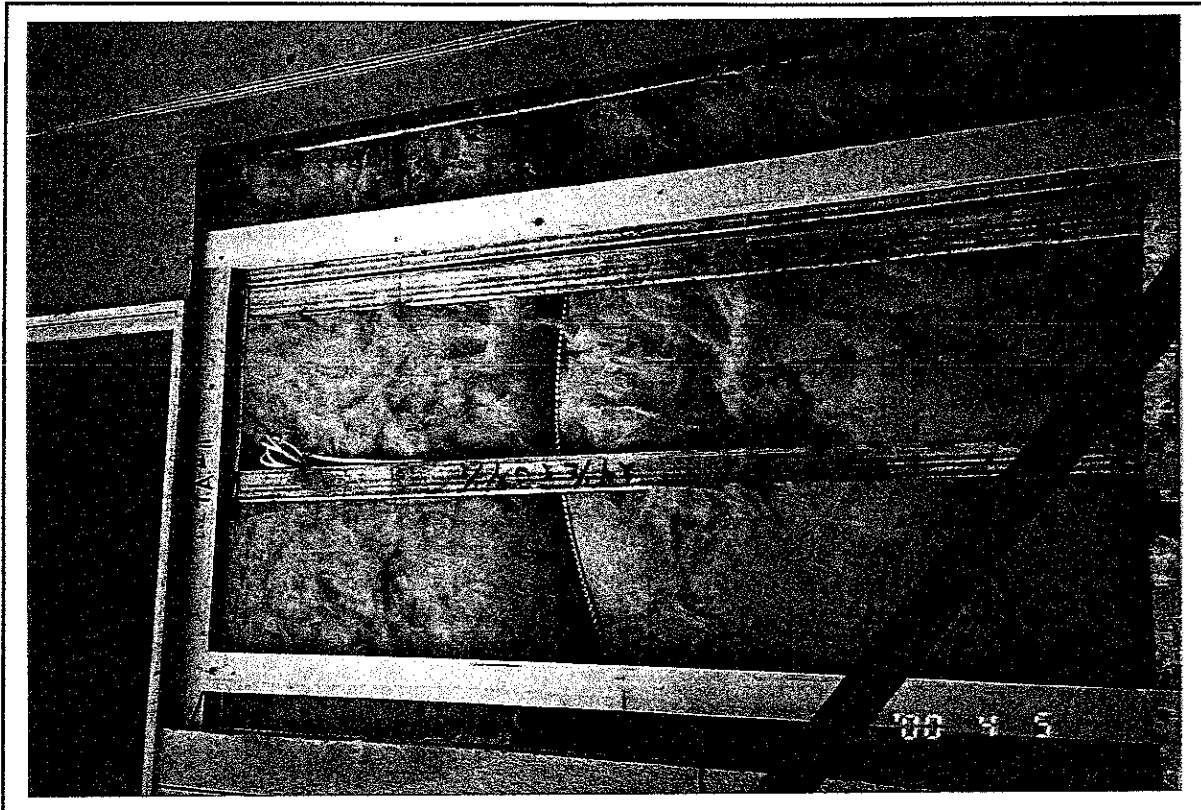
Test Area #11 – Opening at North wall, West of entry
